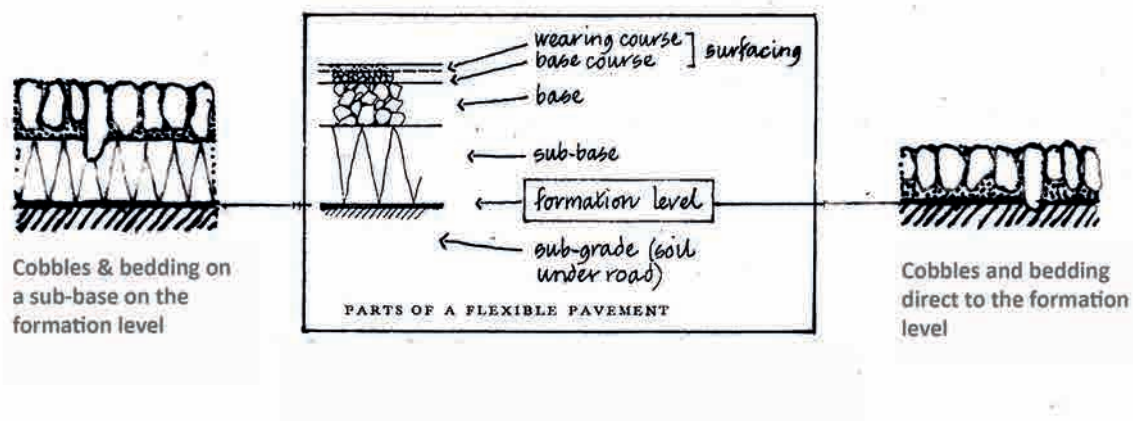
Section through a modern flexible pavement from Elizabeth Beazley's Design and Detail of Space between Buildings, 1960, 29, supplemented with sketches by Ray Harrison showing relationship to cobbled path construction. On the left a sub-base (this incorporates aggregate or may be a more substantial stone construction); on the right cobbles and bedding are laid direct to the formation layer.
